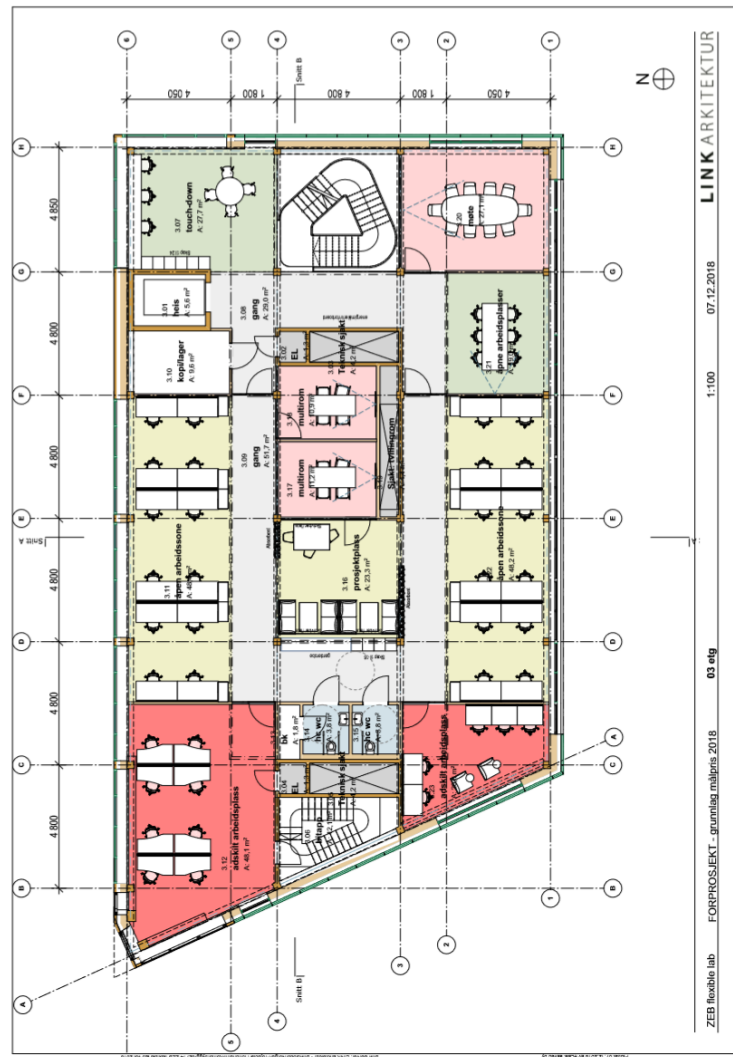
Floor plan of the third floor of ZEB Laboratory.
